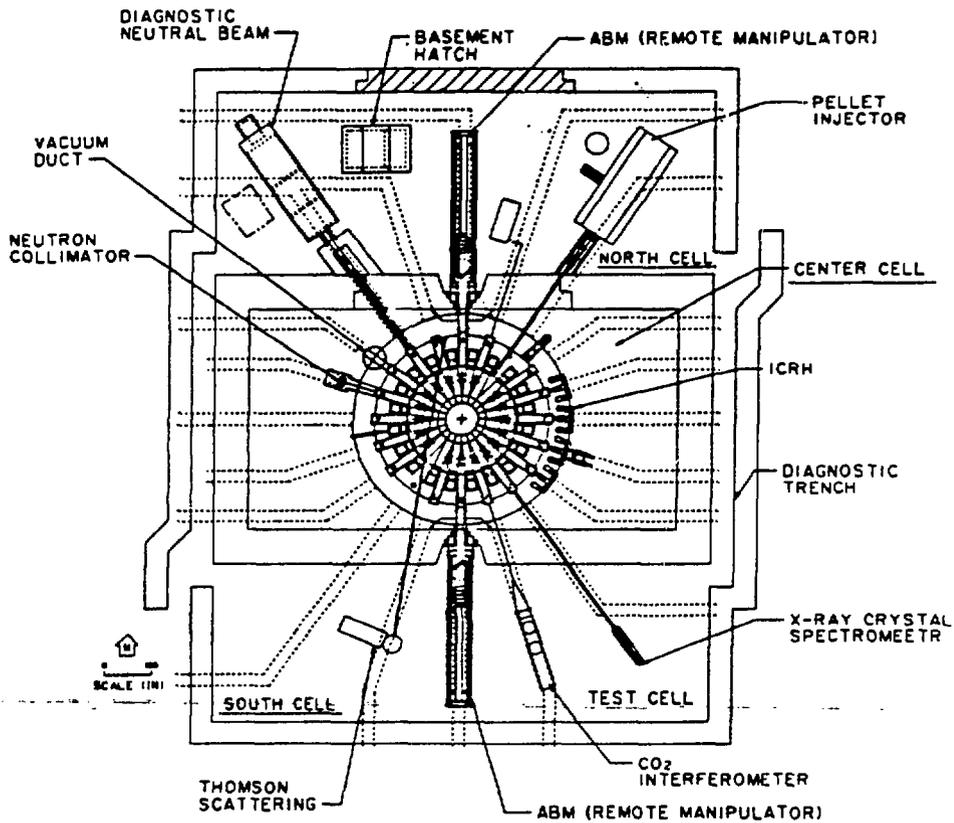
Plan view of test cell facility (rotated 90° from Fig. 1).
